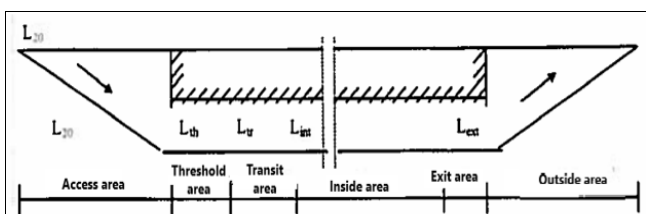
Cross-section with characteristic areas of a road tunnel [3, p. 79]
